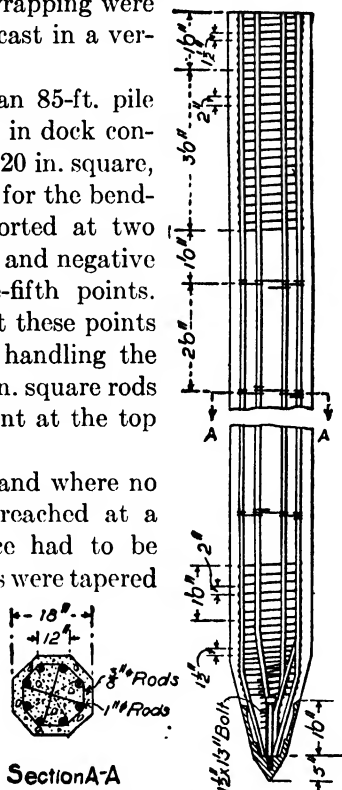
Reinforced-concrete Pile Used in Dock Construction in Cleveland.
